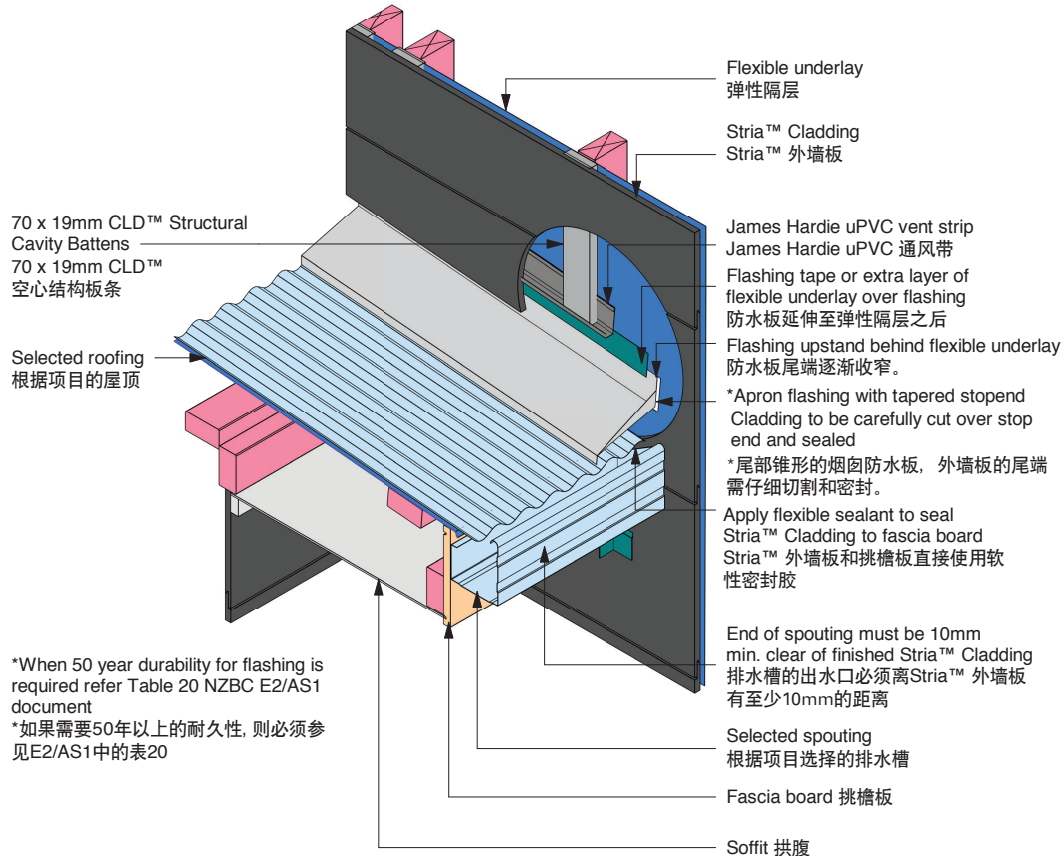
Roof to wall junction detail | 图35: 屋顶与墙连接的详图
